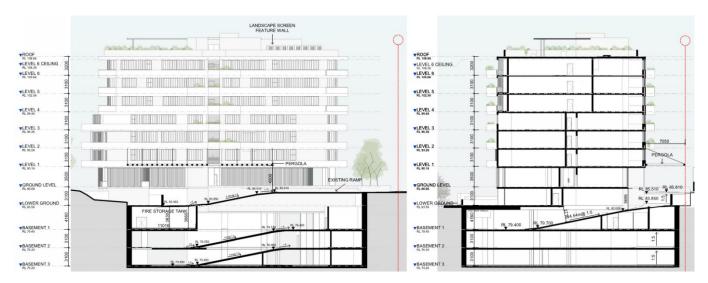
2 Greenwich Rd building sections – North (left) and West (right).
